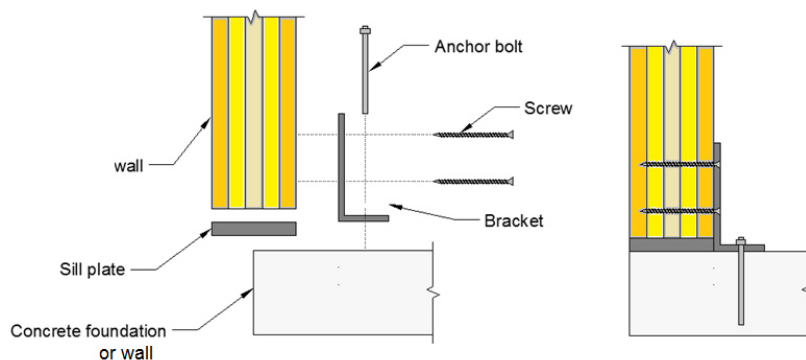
Angle bracket connection for wall-to-concrete/masonry foundation or wall-to-concrete/masonry wall.
